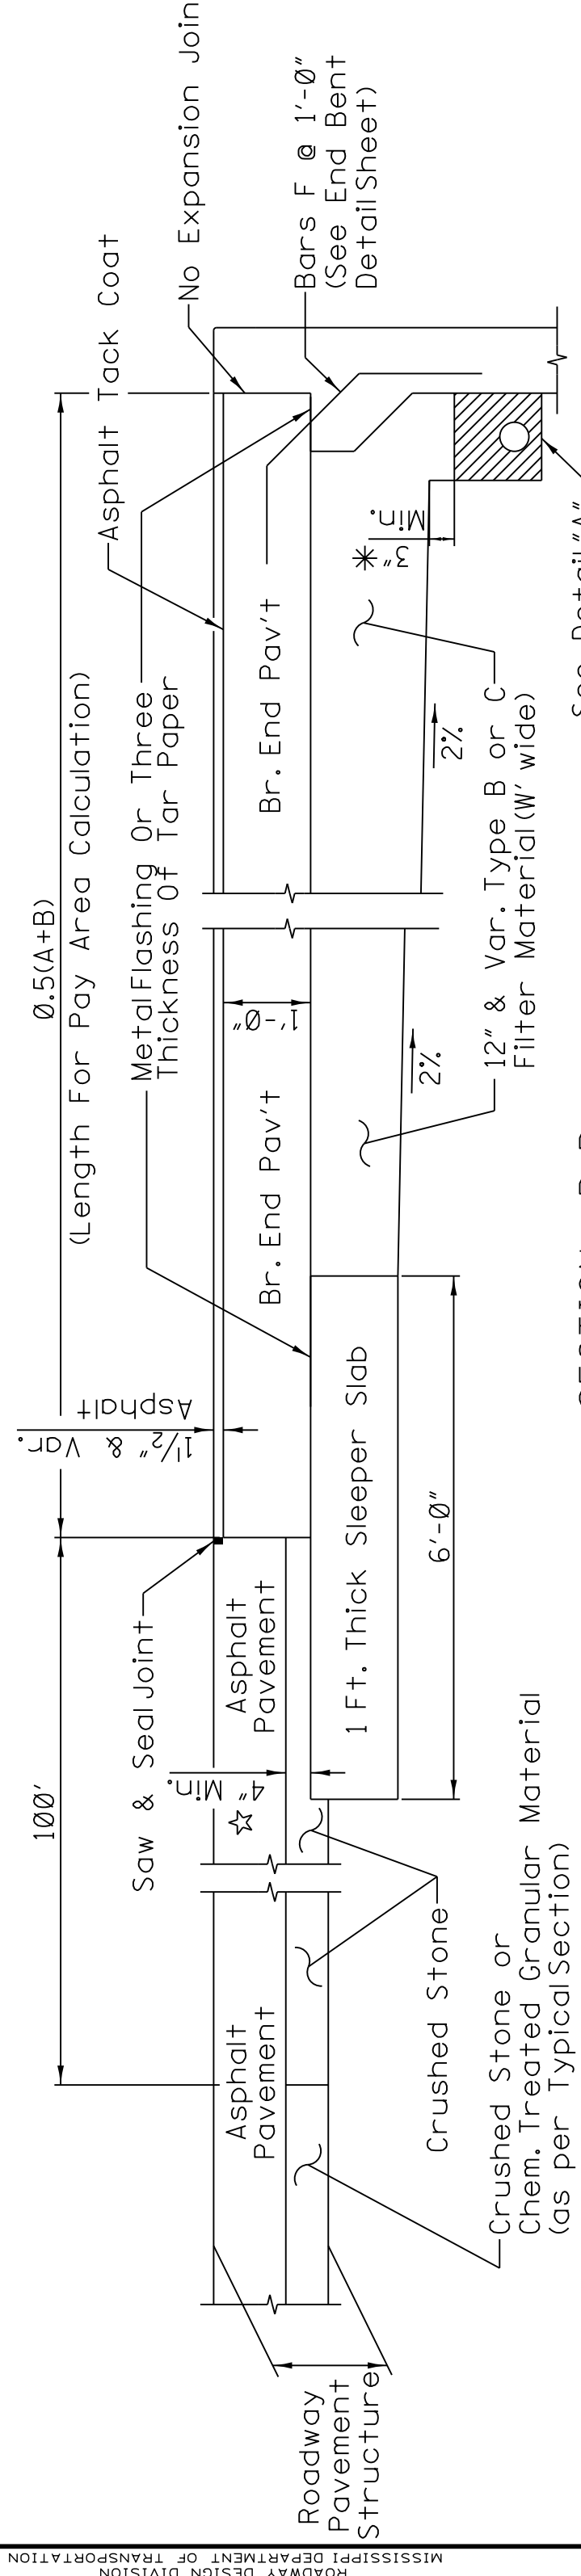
DETAIL SHOWING METHOD OF SEATING BRIDGE END PAVEMENT ON BRIDGES WITH NO PAVING BRACKET
